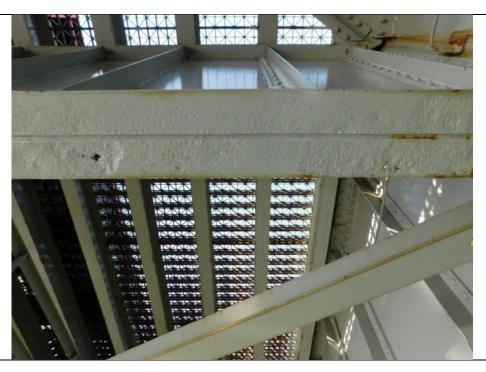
[Span 5, South Leaf] -Floorbeam 3s between G1W-G2W, small holes and section loss in bottom flange near G2W, Looking North
